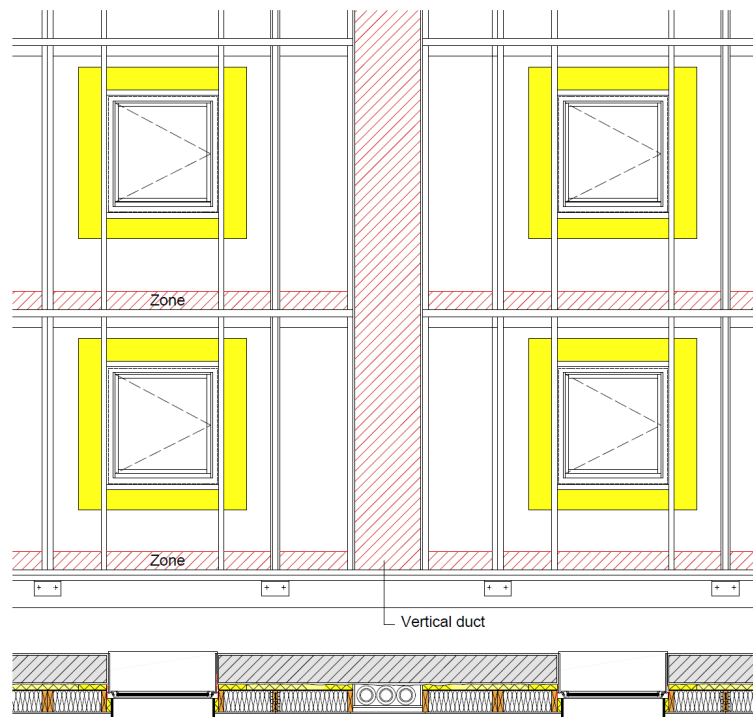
Scheme of prefabricated system for façade retrofitting [7]
